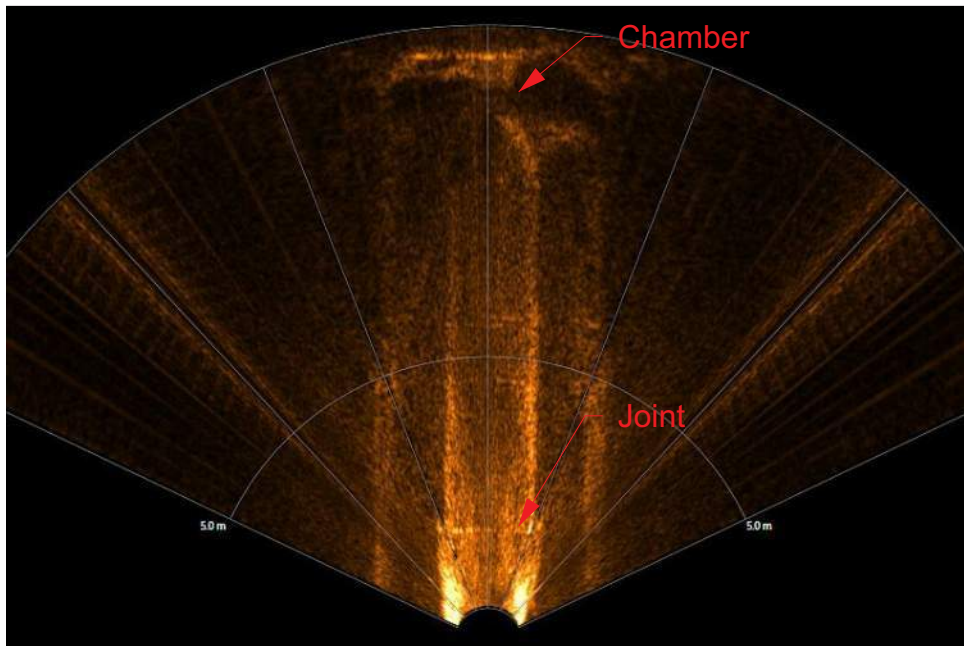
A-8: Sonar image at 171 feet downstream of Manhole 1. Manhole 3 chamber 30 feet ahead.
